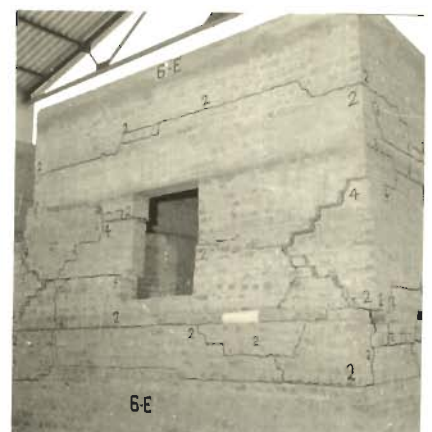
\_ PIERS OF EAST WALL DESHAPED BY SHIFTING OF DIFFERENT BLOCKS (MODEL 6)
